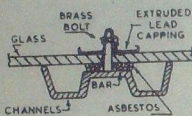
A typical glazing bar of improved type used for glass roofs.
